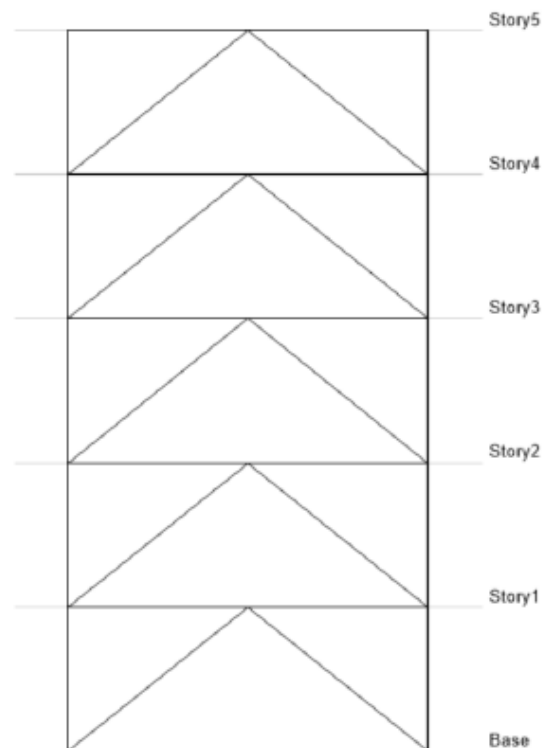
Elevation view of Silo supporting steel structure (TYPE-A brace arrangement)
